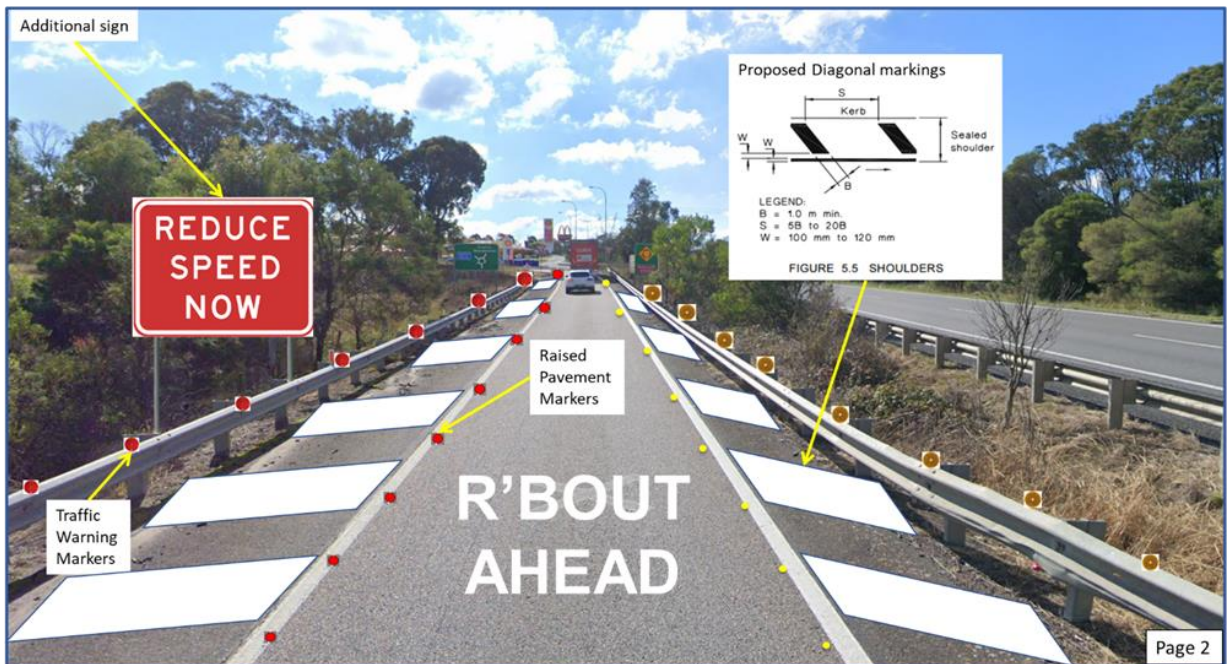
Showing installation of proposed Traffic Warning Markers, Raised Pavement Markers, REDUCE SPEED NOW sign, ROUNDABOUT AHEAD pavement marking and proposed diagonal shoulder markings.
